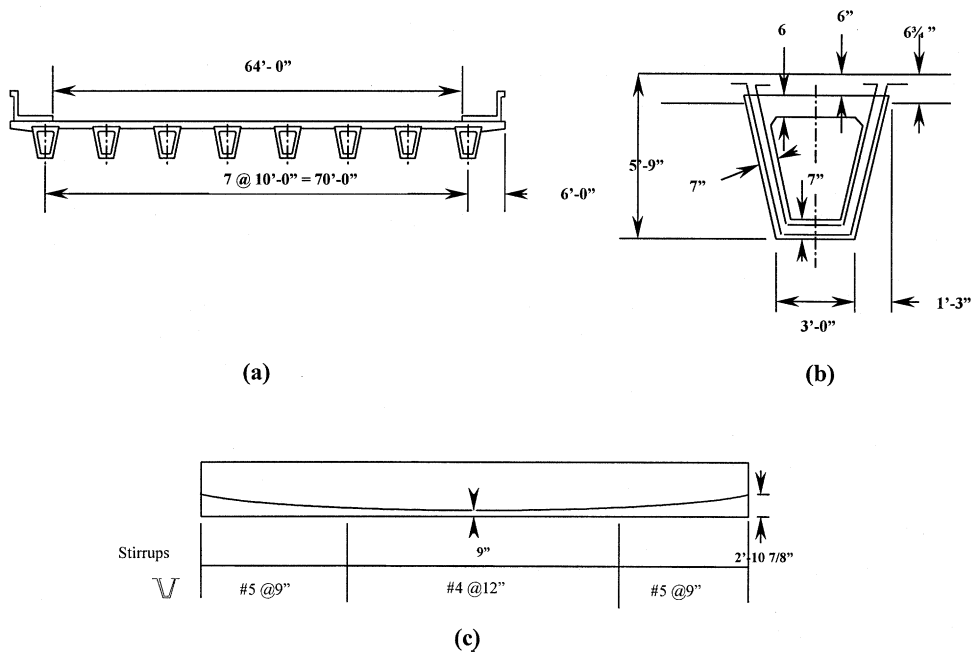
Details of two-span continuous prestressed box beam bridge example. (a) Typical section; (b) beam section details; (c) prestressing tendon profile.
